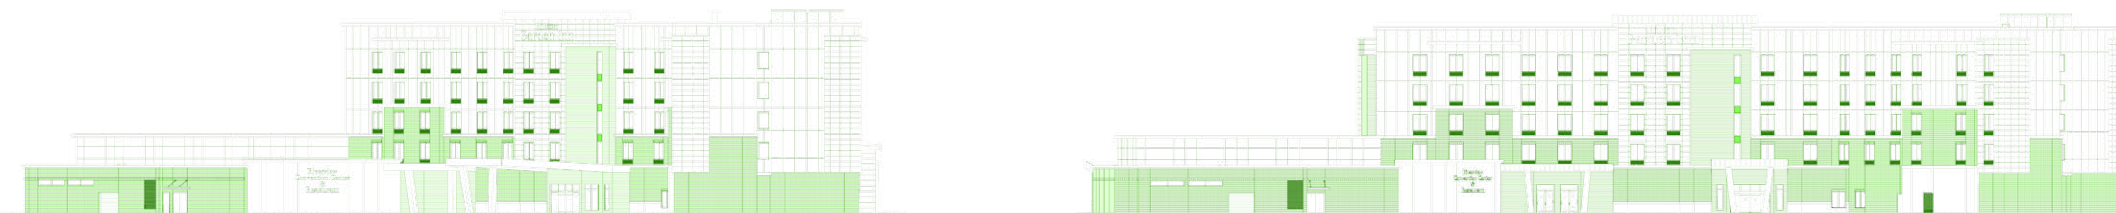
Hilton Garden Inn South East Elevation (VanDeWalle, 2012)
